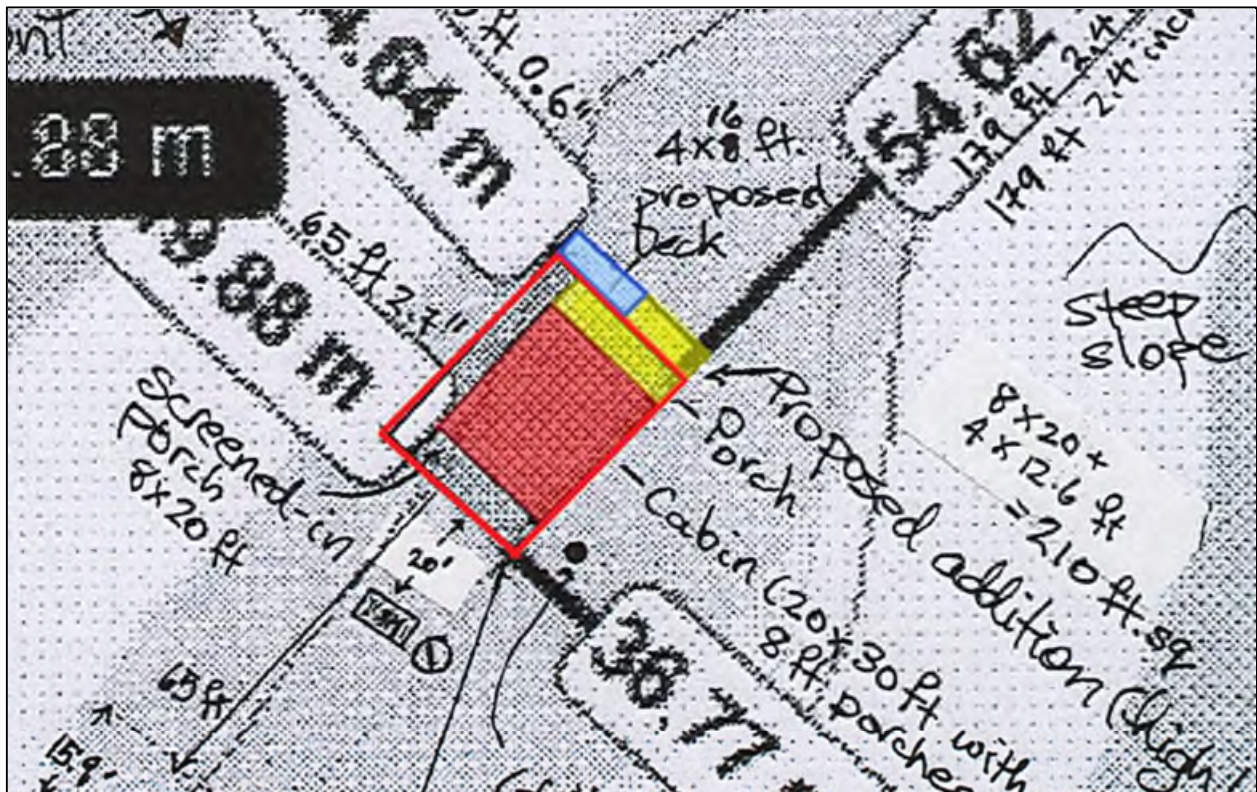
A portion of the plot plan submitted by the applicant showing the existing structure and proposed expansions. The existing dwelling (solid red) and attached deck (red outline), plus the proposed additional enclosed living space (solid yellow) and the proposed uncovered deck (solid blue).
